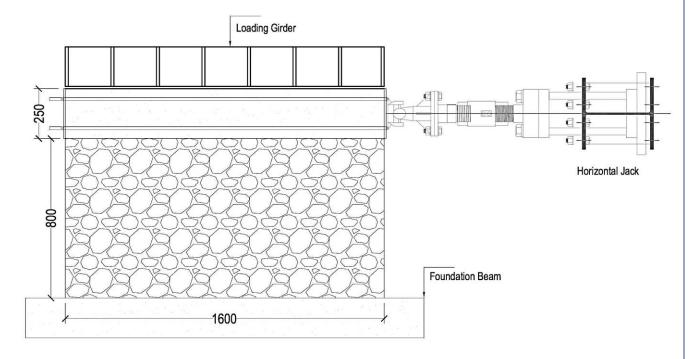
Test setup for in-plane quasi-static cyclic tests on masonry piers (pier thickness scaled to $2/3^{rd}$ of the prototype)
